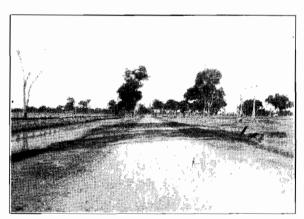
Murray Valley Highway.-Showing shoulders placed on narrow road-way.
